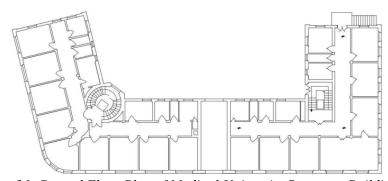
Ground Floor Plan of Medipol University Rectorate Building [27].
